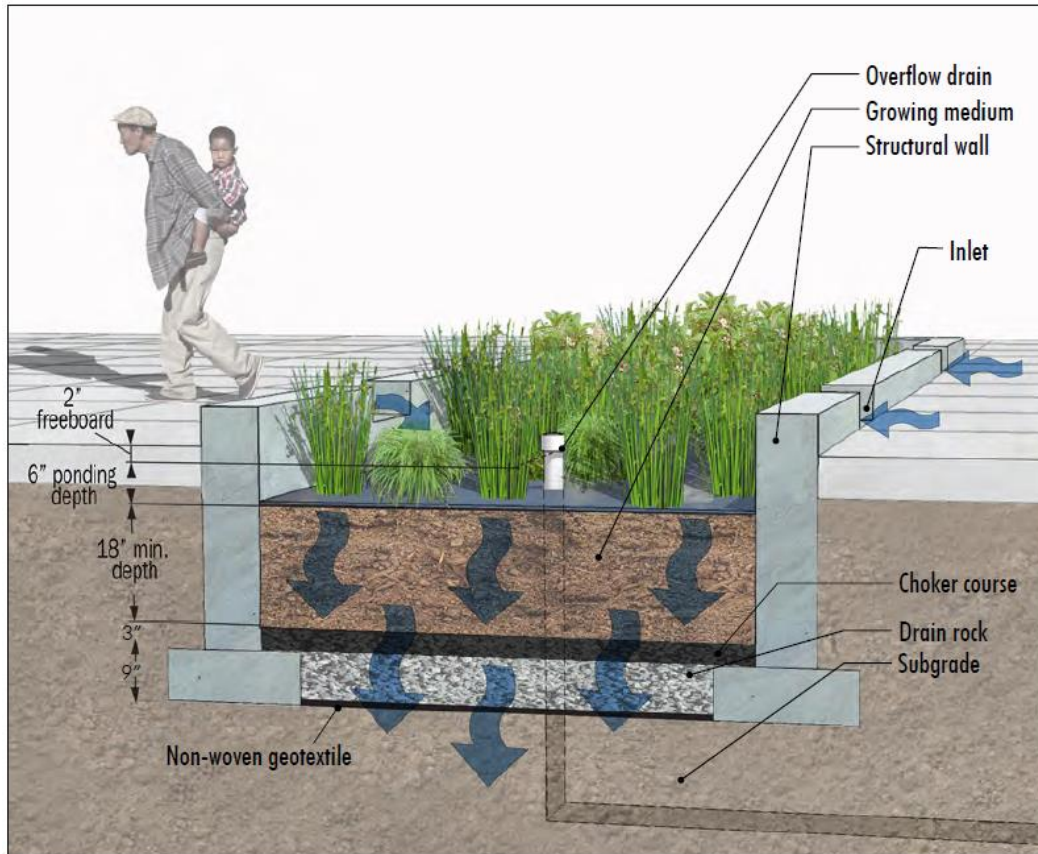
Cross-section view of a bioretention planter between a roadway/plaza (left) and a sidewalk (right) (Clean Water Services, 2016).
